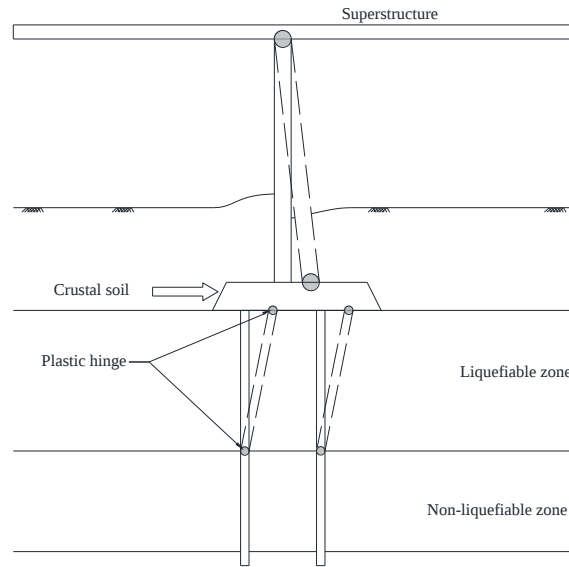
Probable failure mechanism of Landing Road Bridge.
